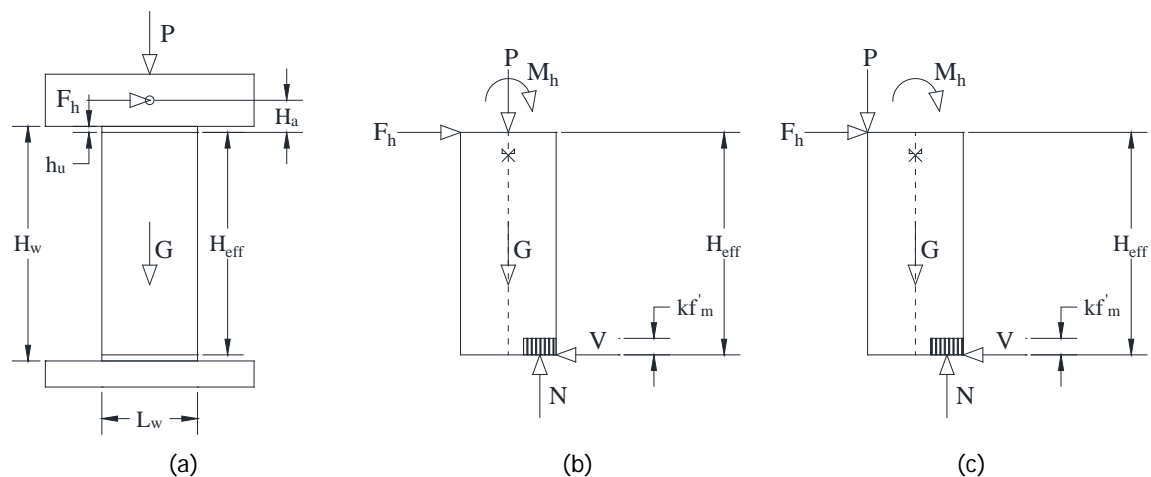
Static scheme for wall subjected to in-plane action: (a) Geometry and loading conditions of the wall in the test set-up; (b) Static scheme for cantilever configuration; (c) Static scheme for double clamped configuration.
